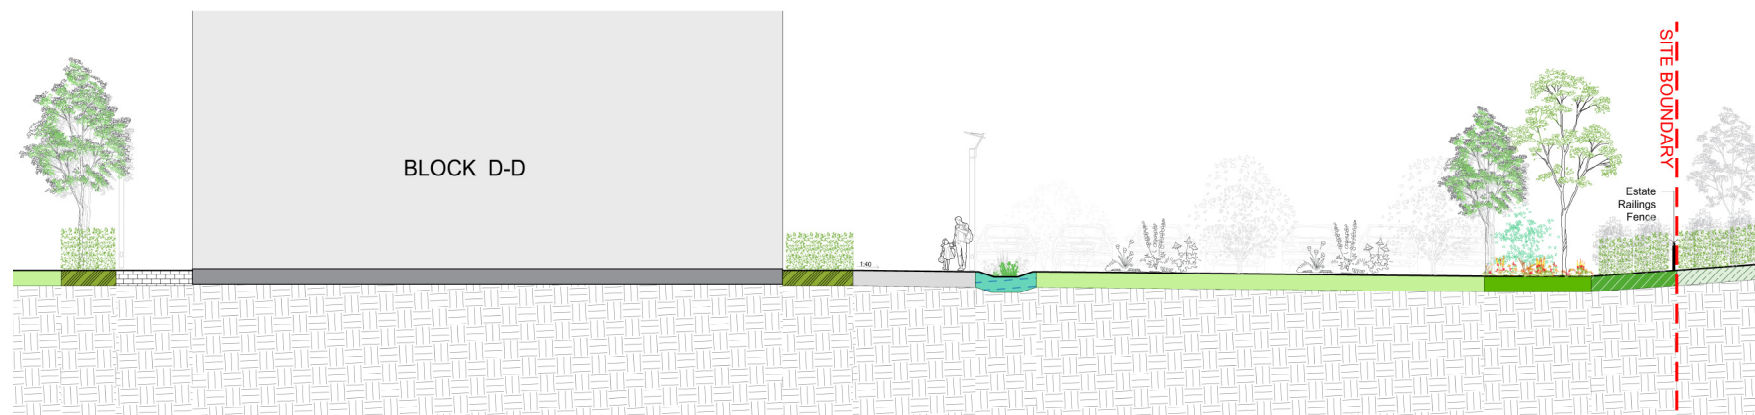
Proposed Landscaping Site Section CC Block D and adjacent popen space area, from CSR drawing no. 25154-2-201
